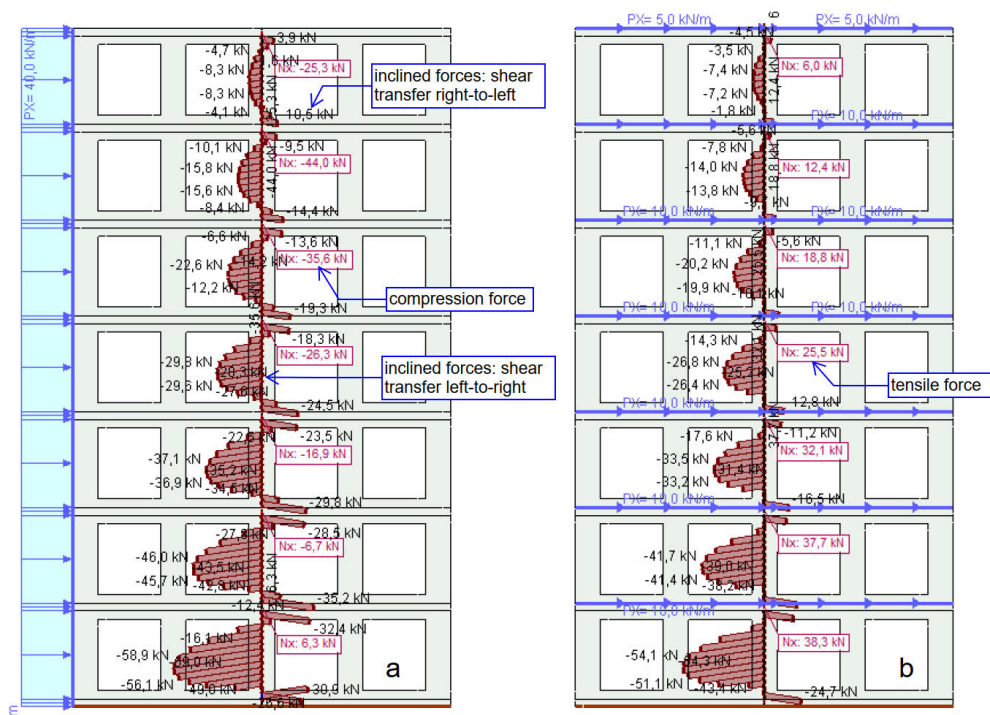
Connection behaviour of cantilever shear walls with lateral line load at the left side (a) and with a horizontal line loads along the slabs (b)
